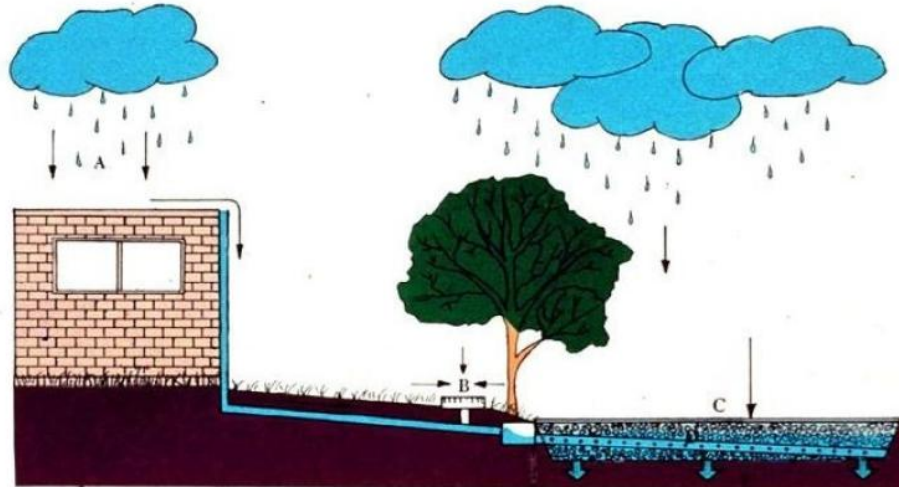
14 : Roof Rainwater Harvesting Adjusted with Permeable Bitumen Pavement
